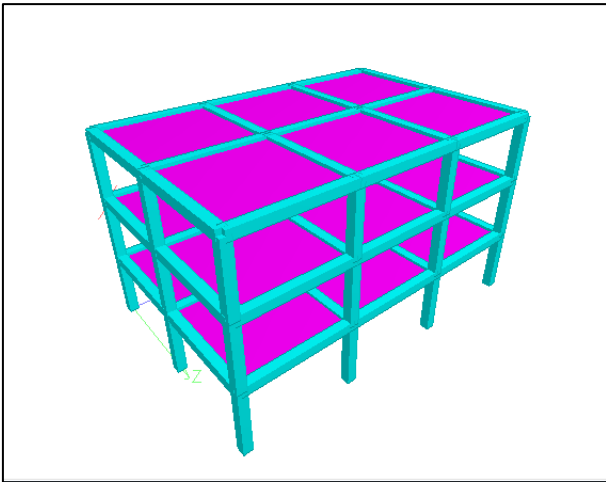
Reinforced Concrete Building Model in STAAD.Pro
